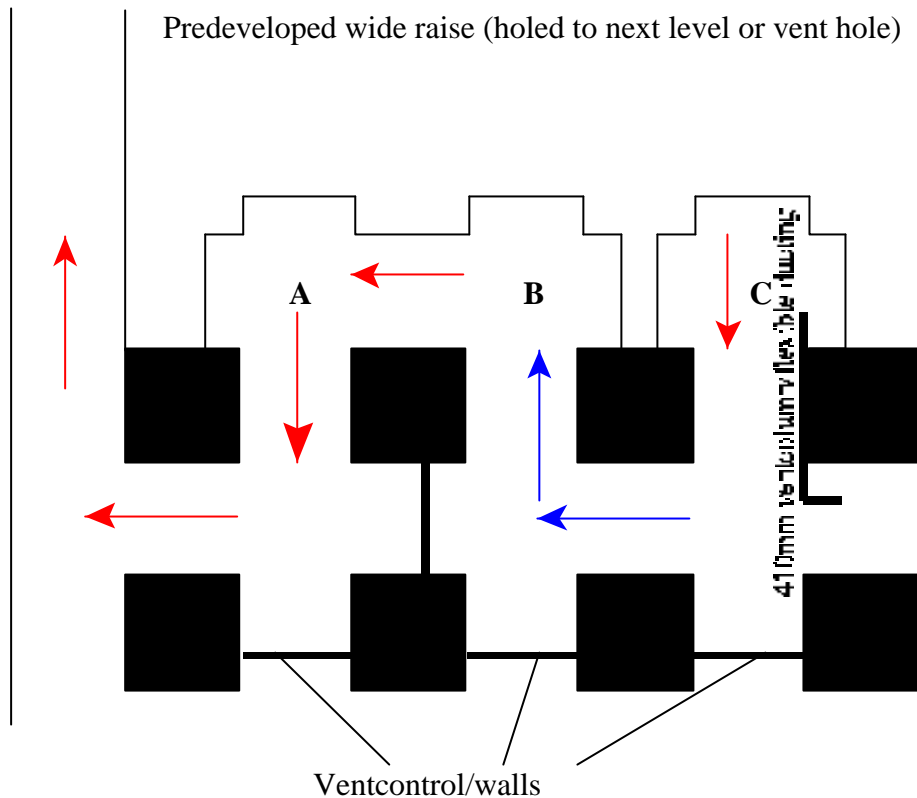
Airflow arrangements in a bord and pillar layout.
